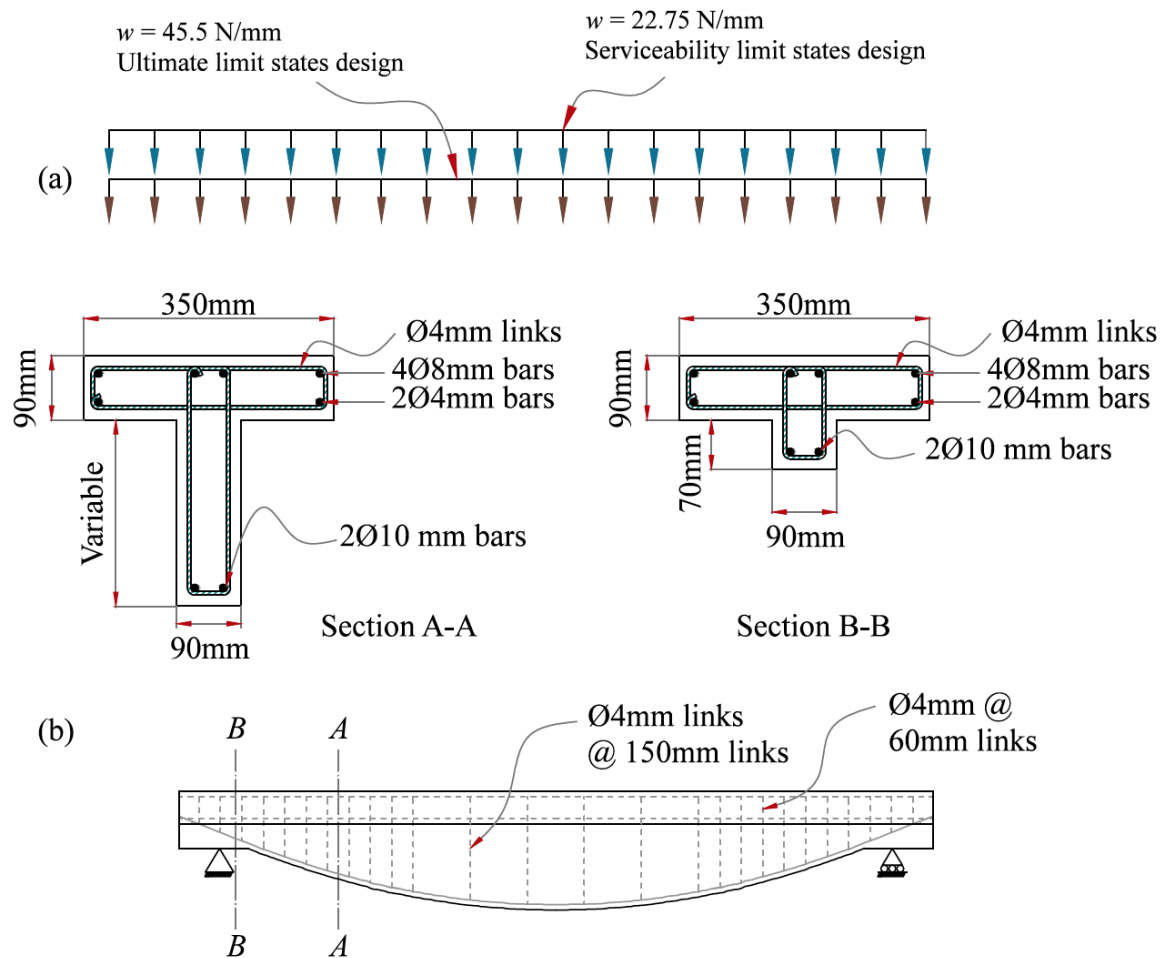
(a) Design loading arrangement, (b) reinforcement details
